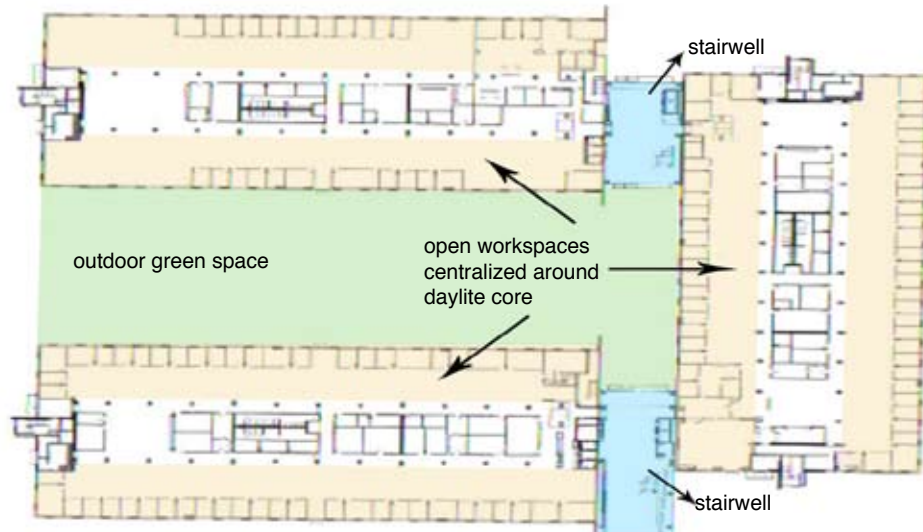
Floor plan shows spatial layout of the core centralized pods in connection with the light-filled stairwells, and outdoor green spaces
